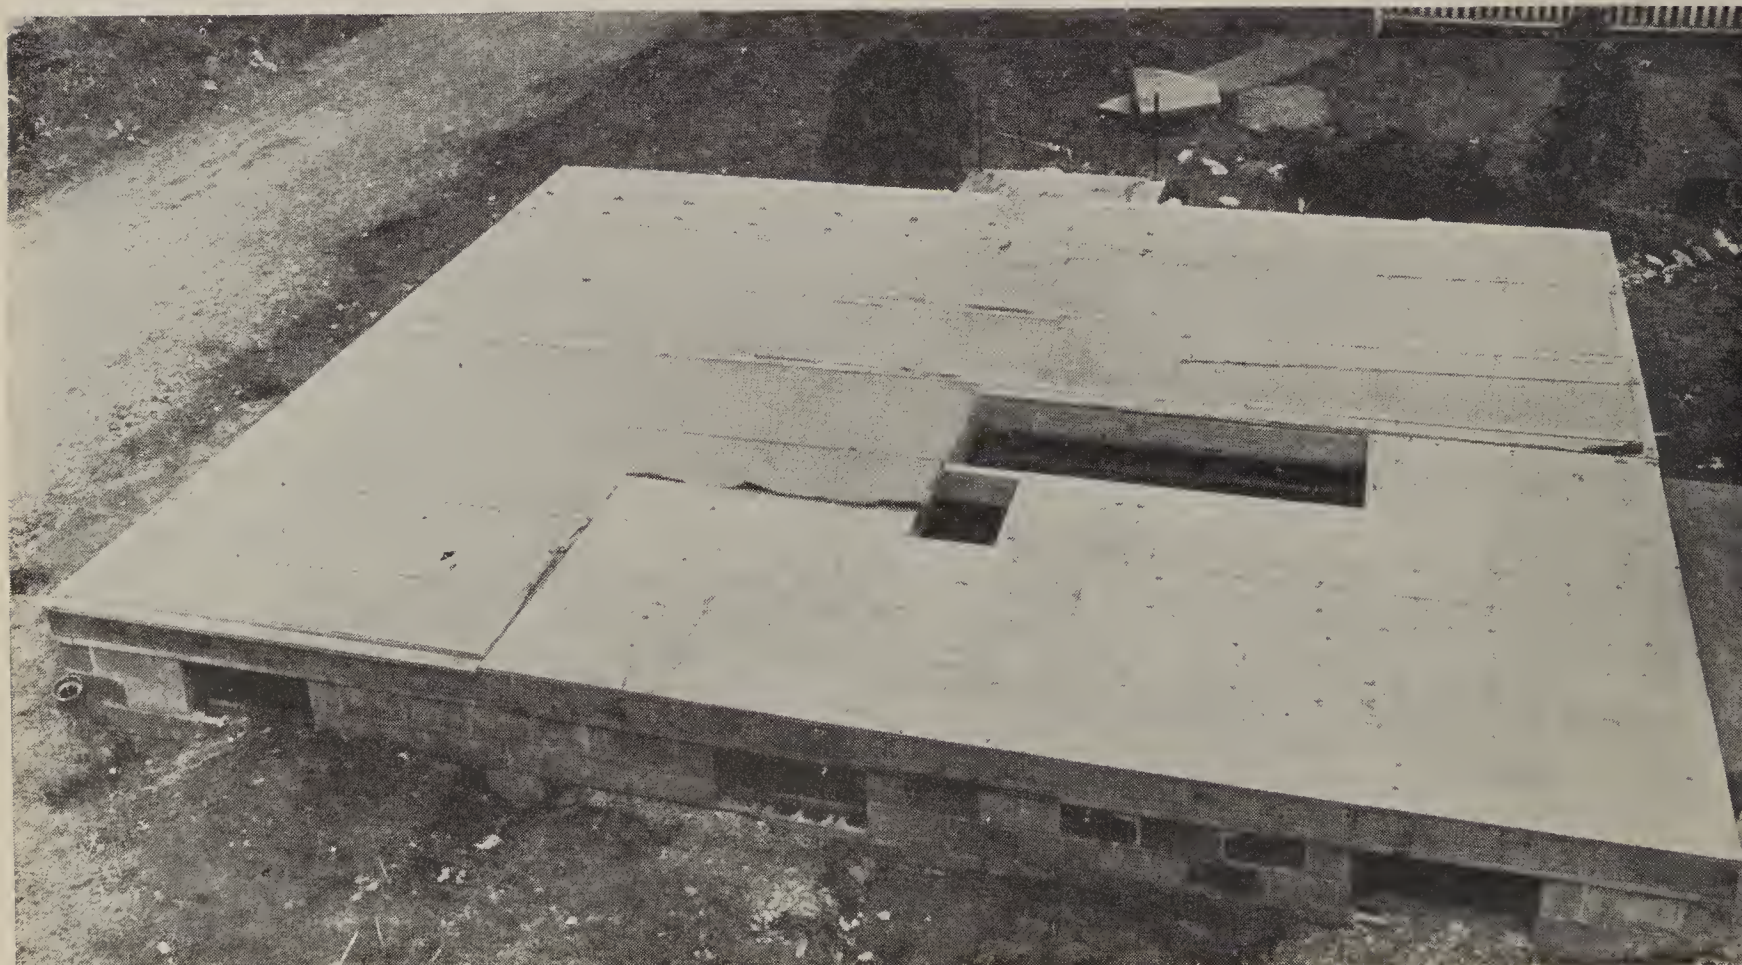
Floor of prefabricated house laid with heavy building paper for protection during erection of superstructure.
